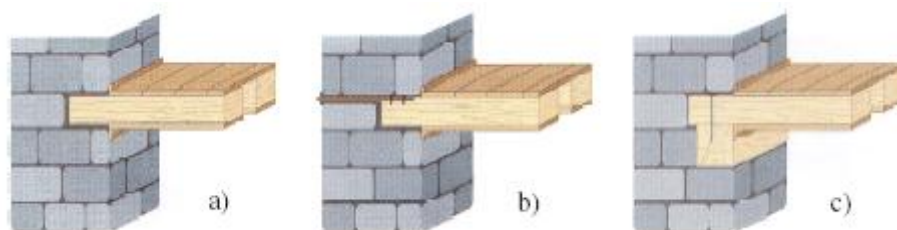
Types of pavement-wall connections. a) Insertion of timber joist at the pocket of the wall; b) Steel anchor; c) Connection with rim joist. (Appleton J. , 2005)
